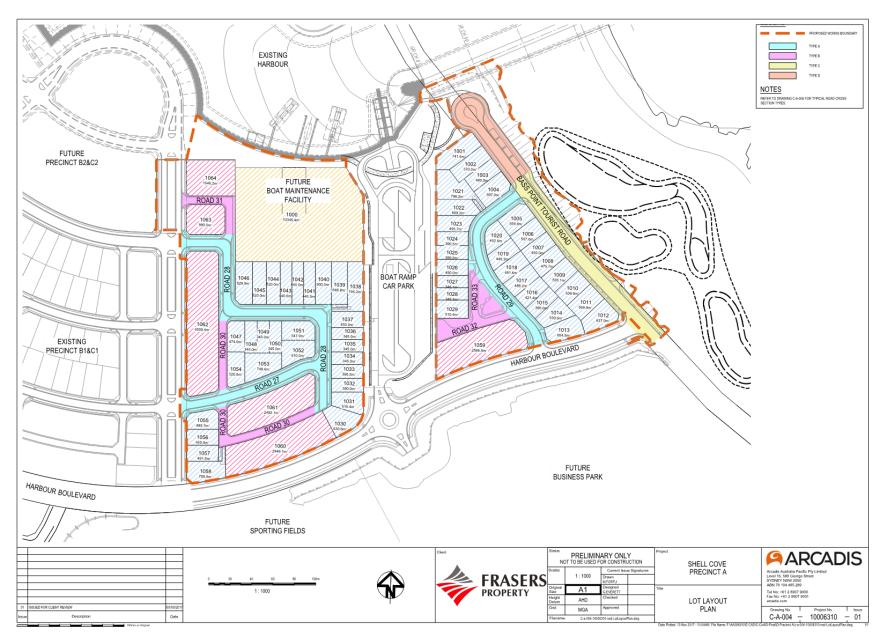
Precinct A Road Hierarchy and Lot Layout
